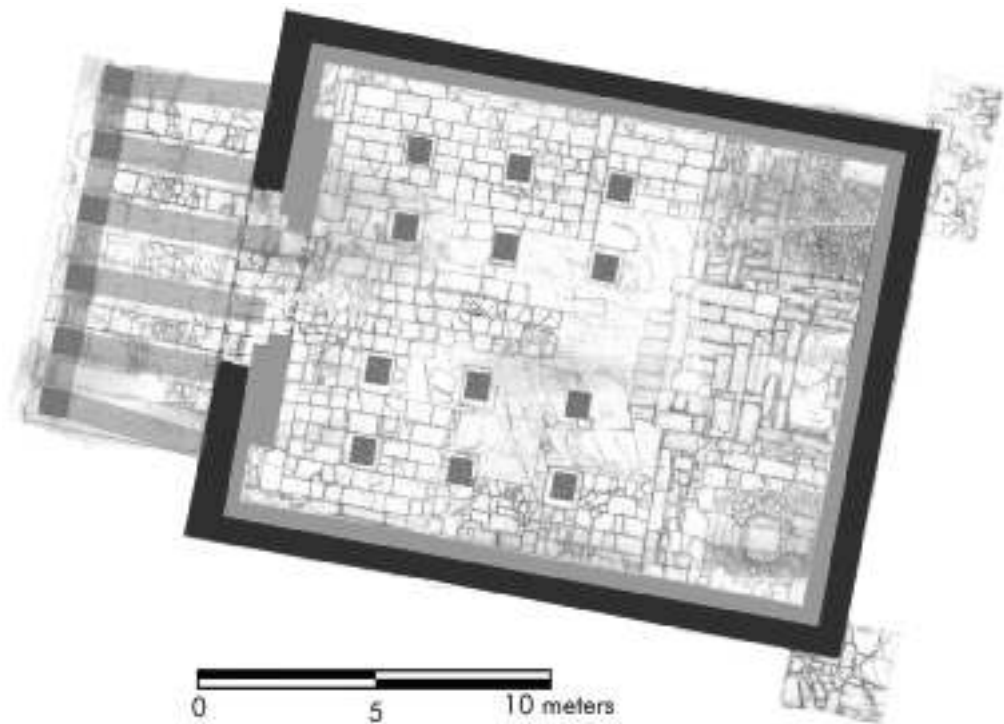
Ground plan of the propylon with the projected architraves and the girders between the architraves and the front façade of the temple. Note the displaced axis of the pillars and the contact zones of the horizontal girders at the perimeter wall.
